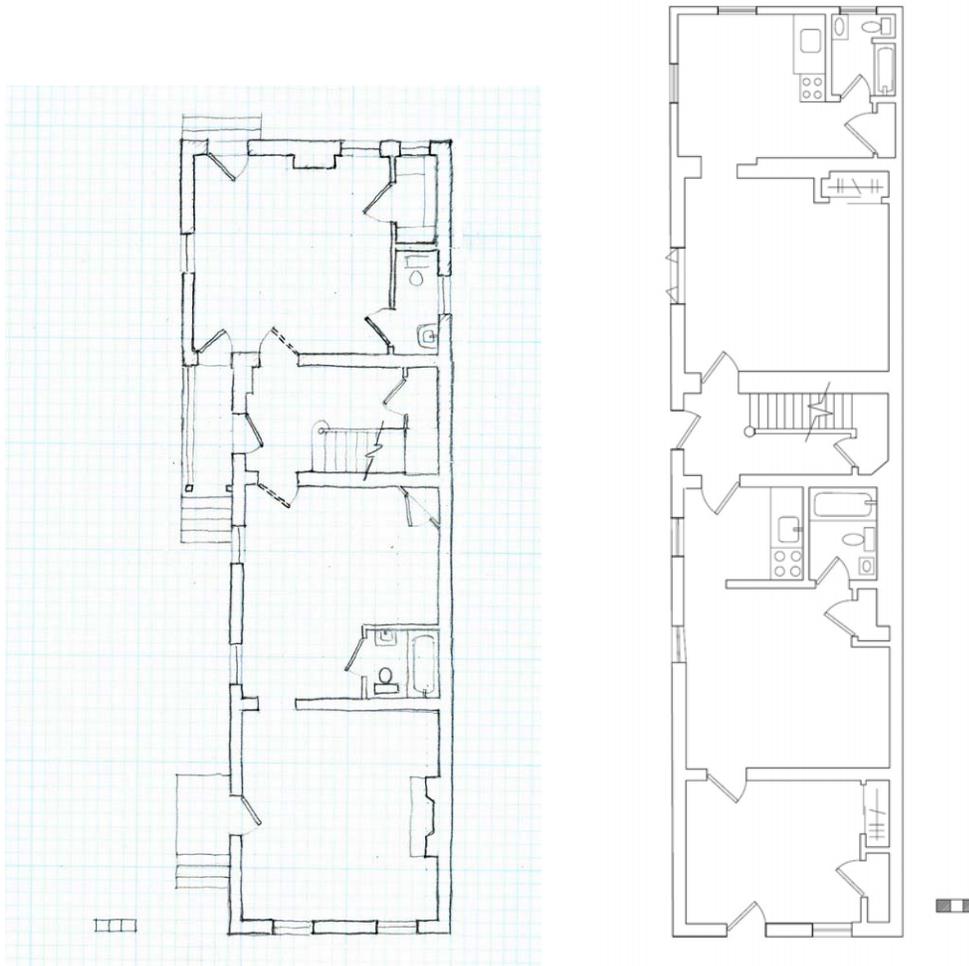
Left: floor plan of 527 West 12th Street measured and drawn by Bill Macintire, scale in feet; right: 521 West 12th Street. Floor plan drawings by Bill Macintire and Danielle Jamieson, scale in feet.
